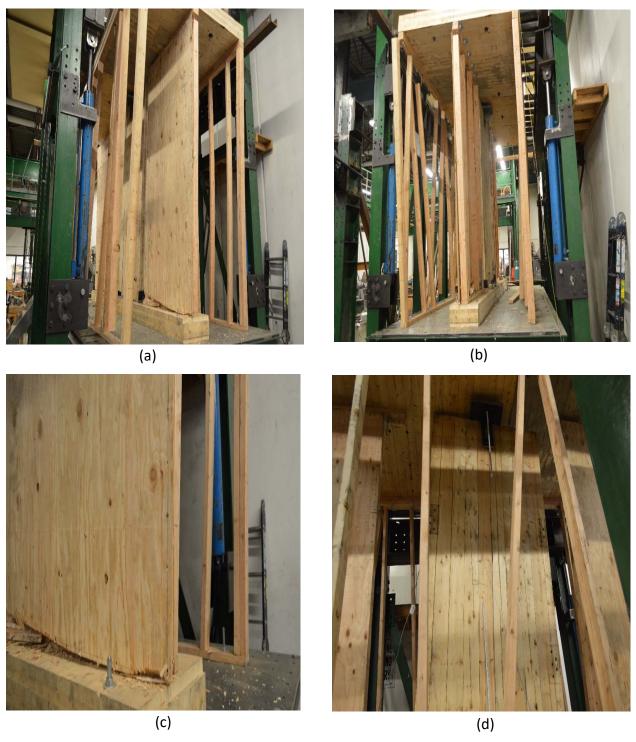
(a), (b): Damage to the overall structure; (c): Damage to the sheathing of the LiFS wall; (d): PT bar fracture and damage to the stude of the gravity wall
